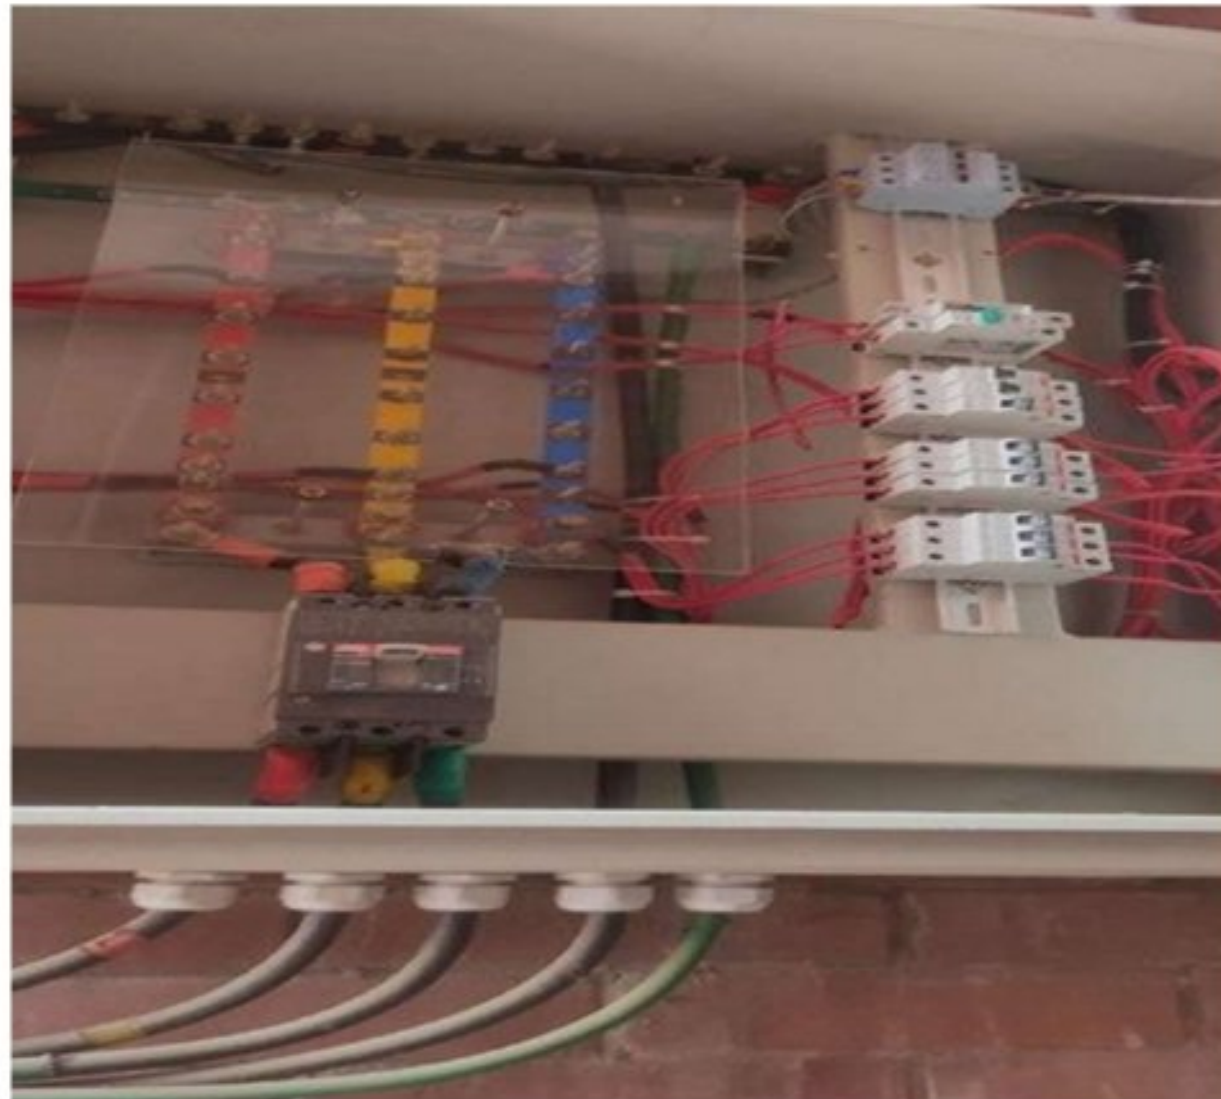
Main distribution board (AC load) of 3rd floor of 1st academic building
